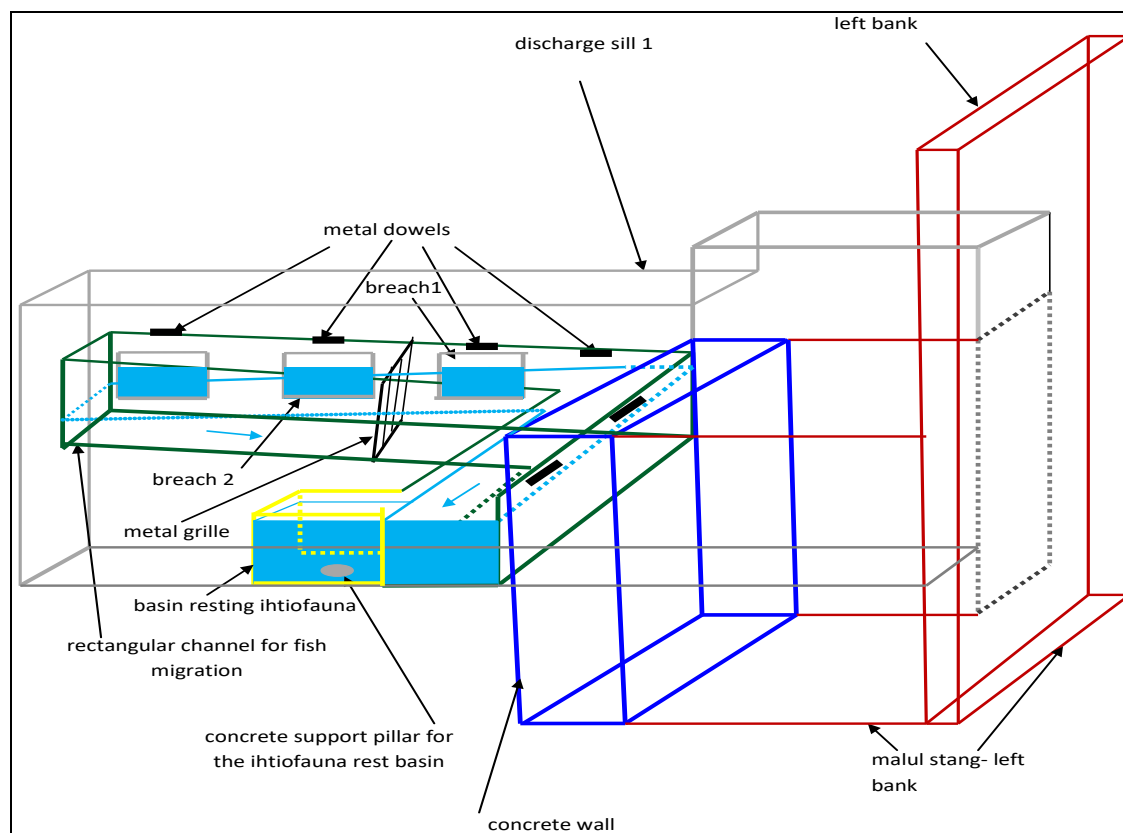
Positioning of the concrete channel on the spillway and the concrete wall – indicative scheme.
